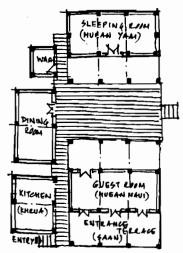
Typical Thai house plan (Source: Blundell Jones, 1988, p.69)
